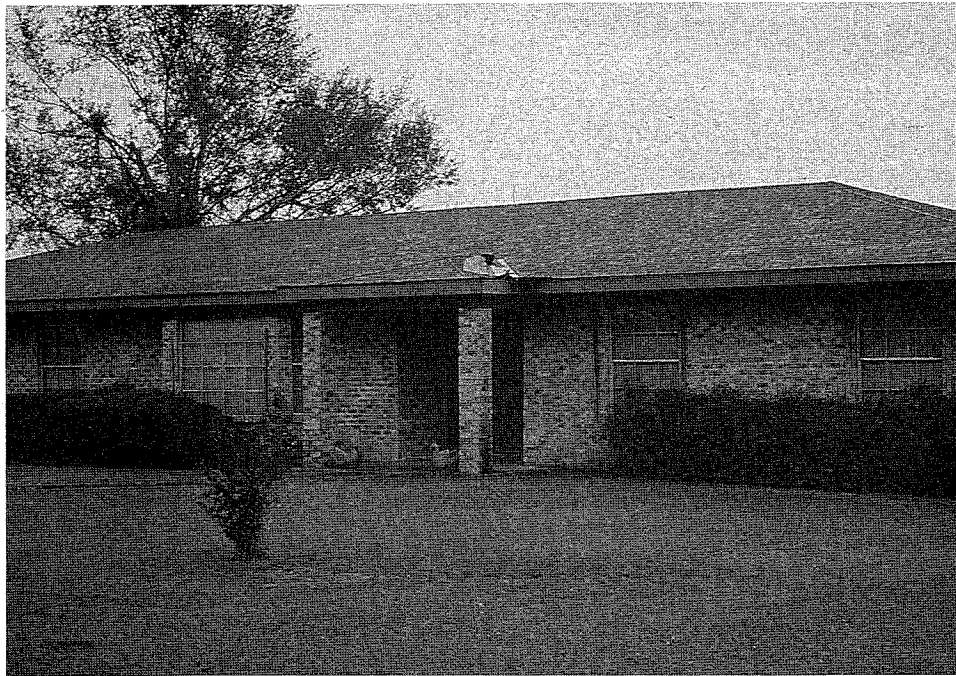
Inland home with minimal damage to roof shingles.
